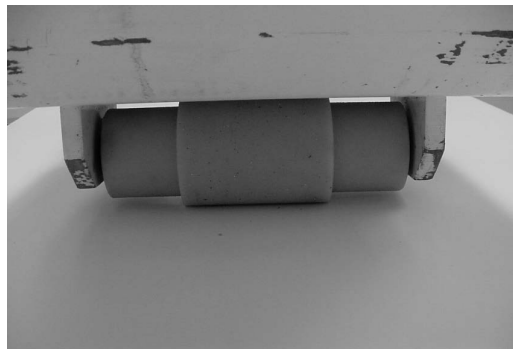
Tamper cart roller that has been modified for tamping in grooves.
